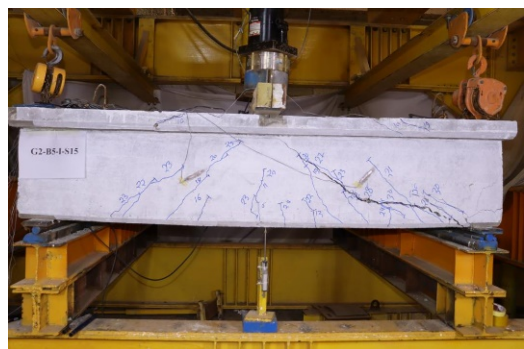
Failure crack pattern of specimen G2-B5-I-S15.
